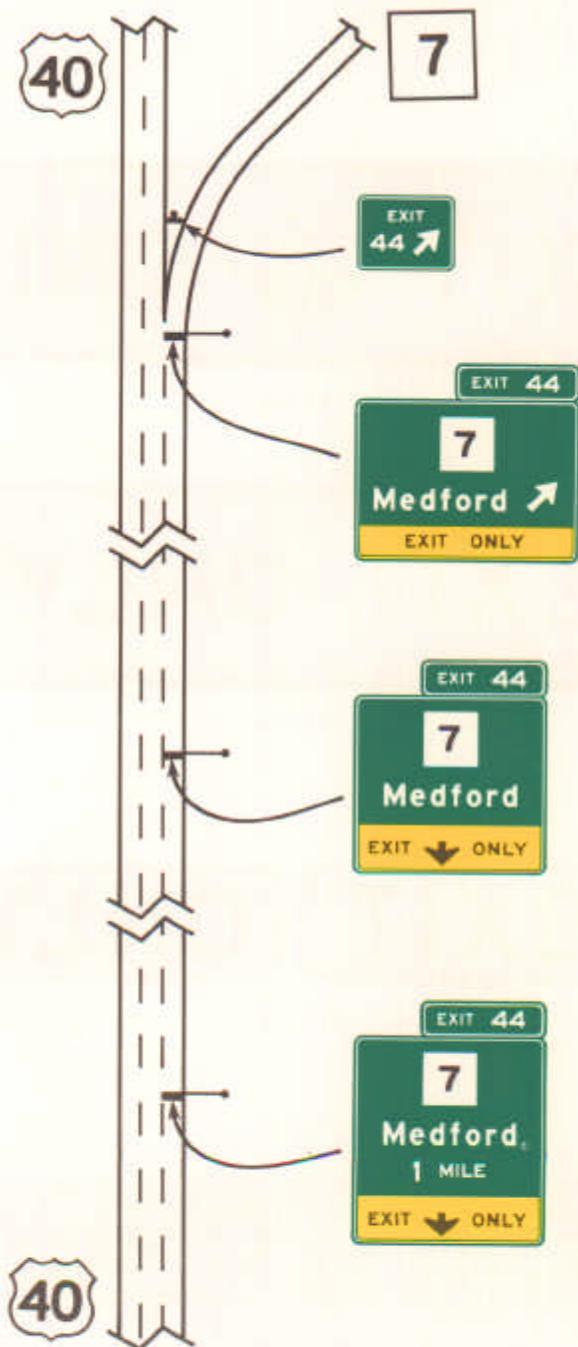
EXIT ONLY on right (Right hand interchange lane drop).
